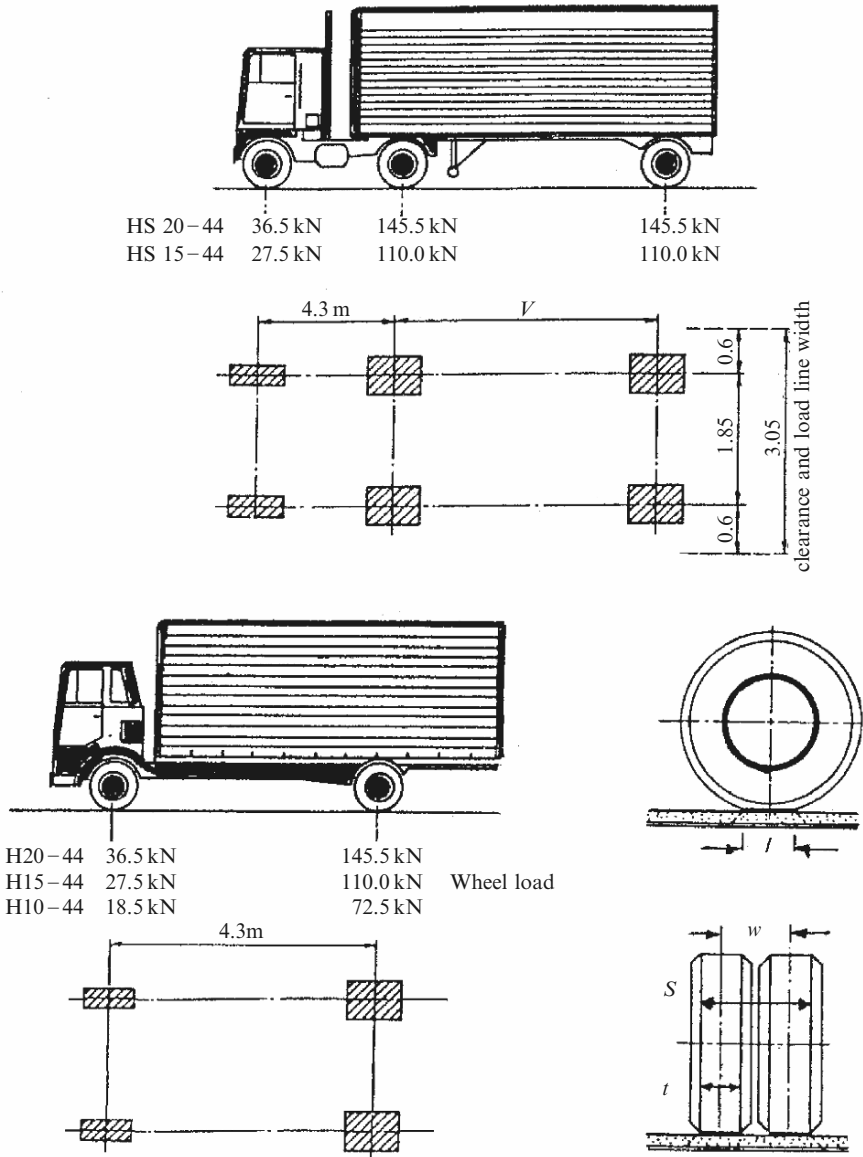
Typical North American trucks (courtesy of the North American Trucks Association, New York)
